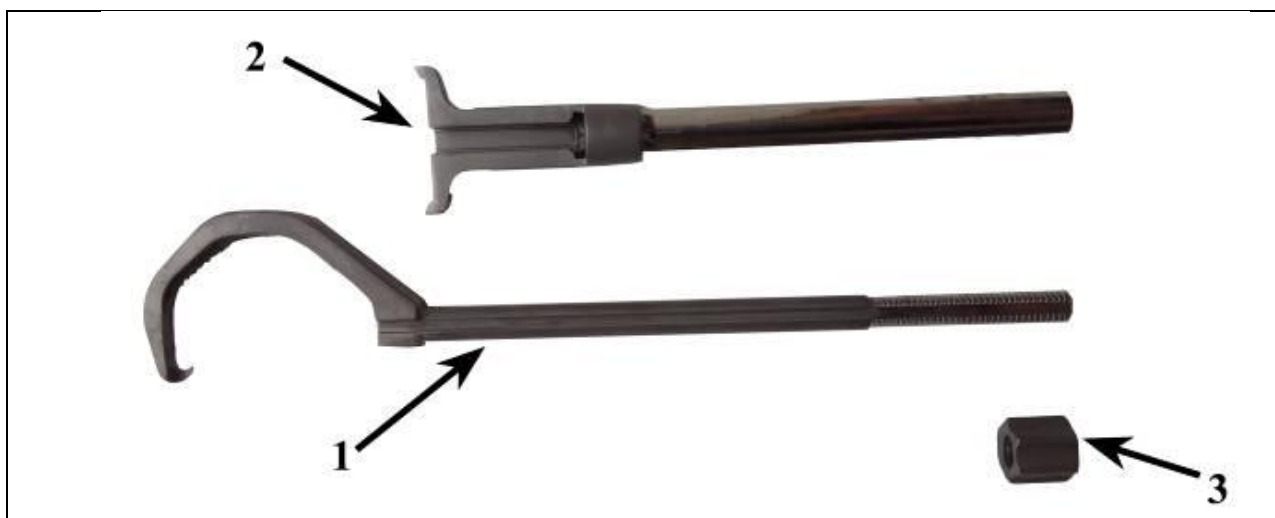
SUV-clamp when disassembled, where: 1 – hook-shaped part; 2- T-shaped part; 3 - nut
